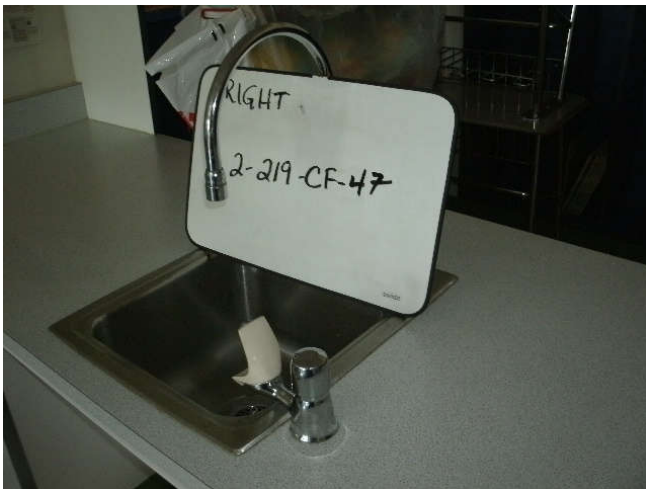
Classroom faucet w/bubbler, located on the 2nd floor, in room 219.
